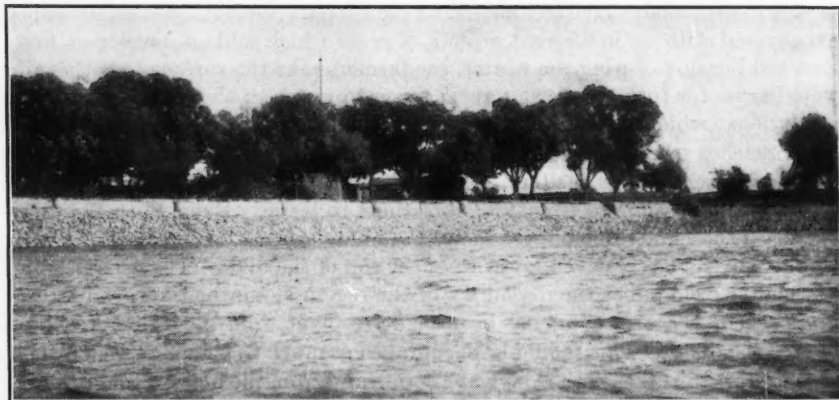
GOOD STONE WALL BANK PROTECTION WITH RIP-RAP ALONG YELLOW RIVER BANKS,
